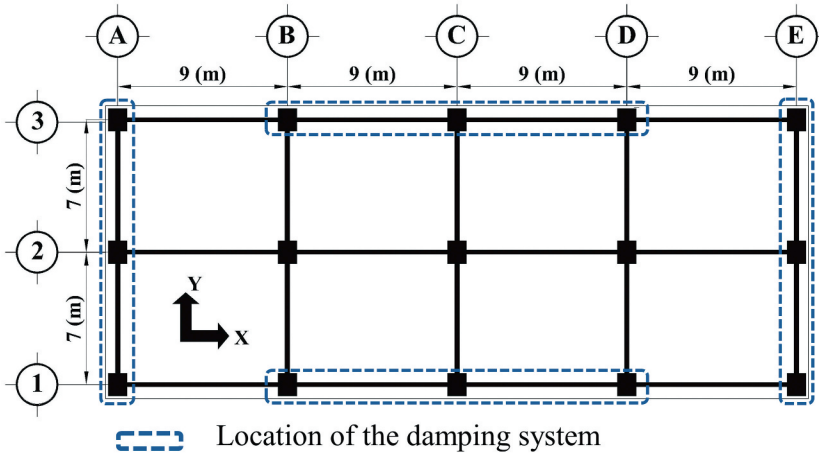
Plan dimensions and location of the damping system for the building of example 1.
